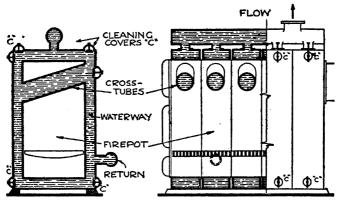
Typical Sectional Mild-Steel Boiler. (Ratings up to 1,000,000 B.T.U./Hr.)
